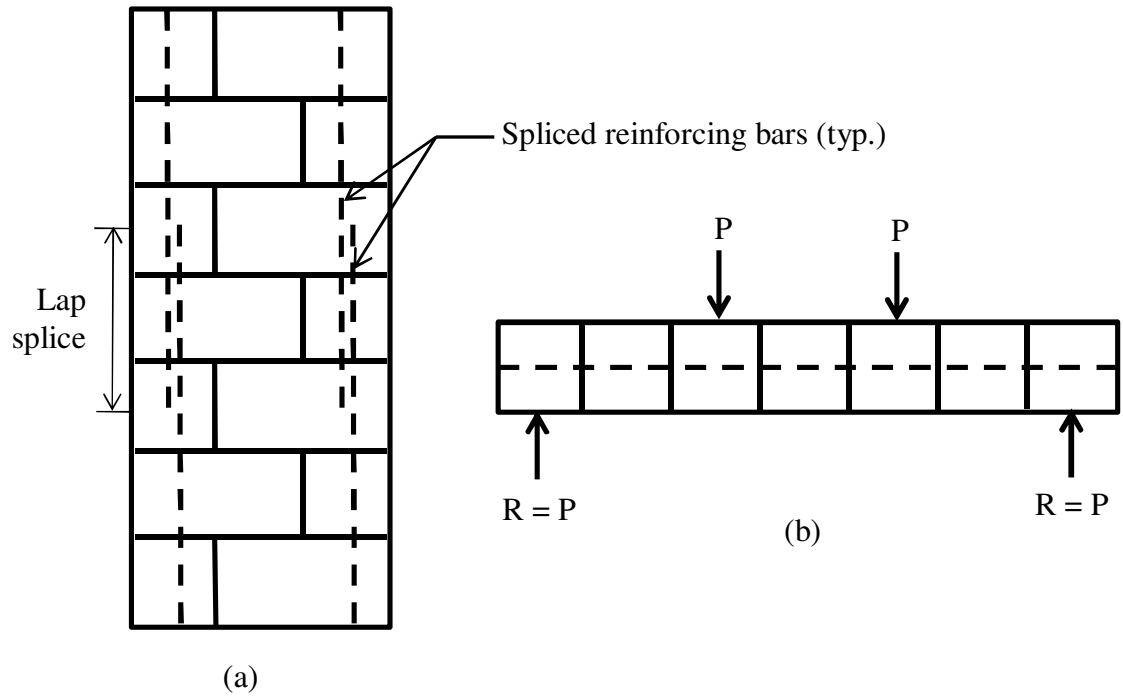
Flexural wall test specimens by Ahmadi: (a) plan, and (b) loading arrangements (Reproduced from Ahmadi, 2001).
